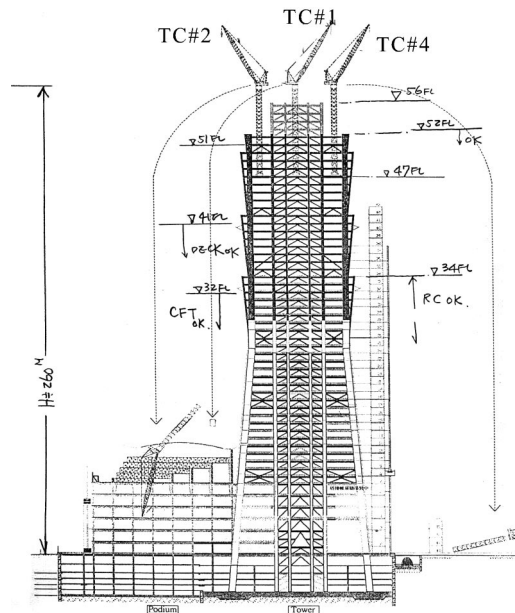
Elevation view of the frame and tower cranes of TFC construction site. The locations of two fallen cranes are also indicated in this figure.
